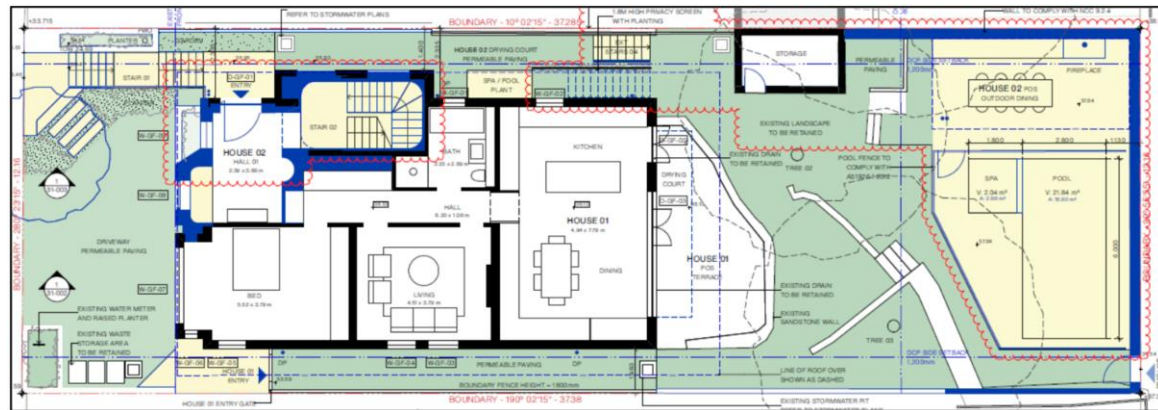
Ground floor plan 10 Moore Street (Source: Tribe Studios)
